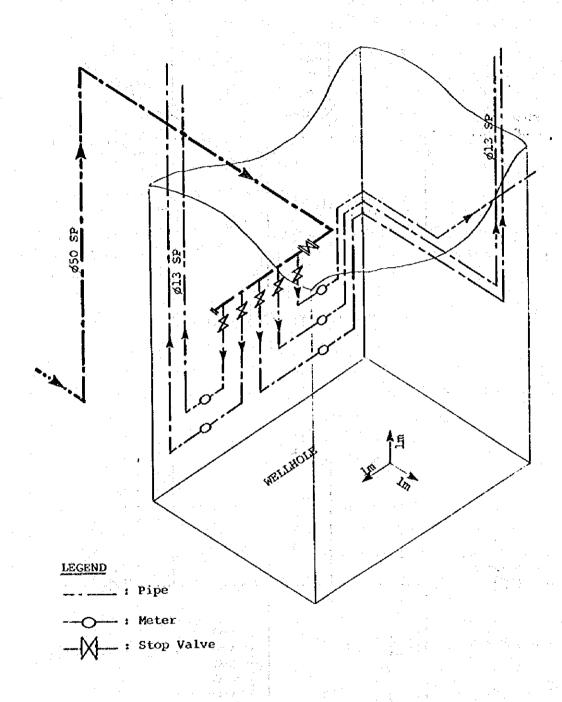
SCHEMATIC RISER SAMPLE IN WELLHOLE OF APATRMENT HOUSE (1)
